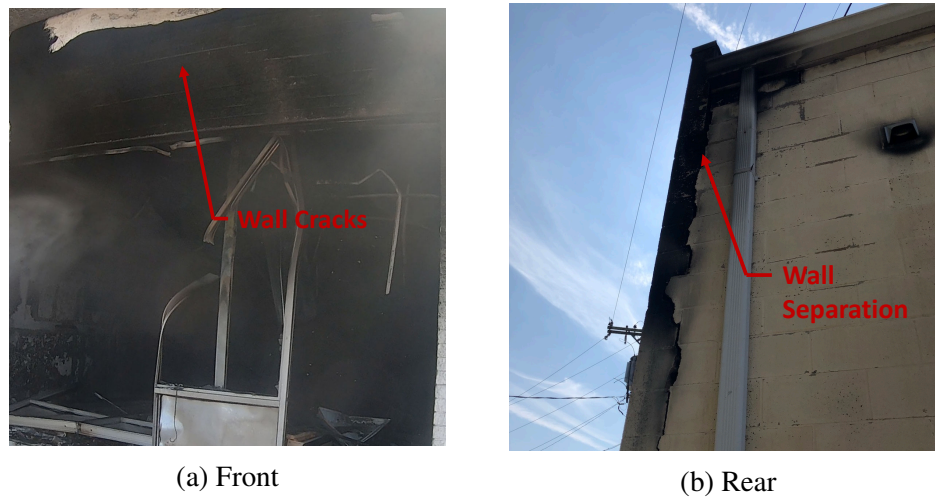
Images of front and rear structural wall damage from Experiment 3.
